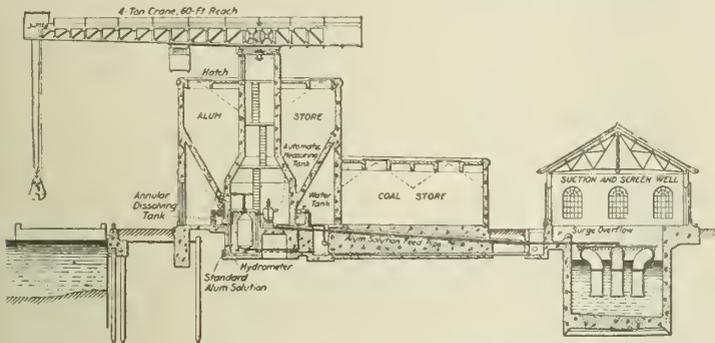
Section of the Coal-Chemical Building and Suction Well.
